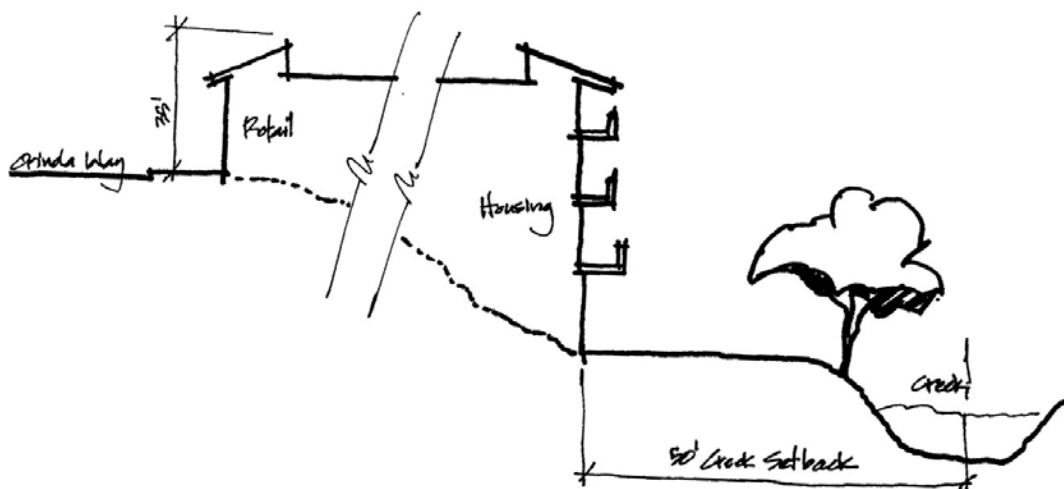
shows a preliminary sketch of a conceptual development along the creek. As shown, the building frontage along Orinda Way could be occupied by a retail business with a 35-foot building height. As the topography slopes down toward the creek, the building height relative to Orinda Way remains the same but the slope allows for a taller structure in the rear overlooking the creek. Flexibility in the number of stories within this height limit would allow for buildings that still respect the established height limit as measured from Orinda Way instead of existing grade at any given part of the parcel or parcels.
